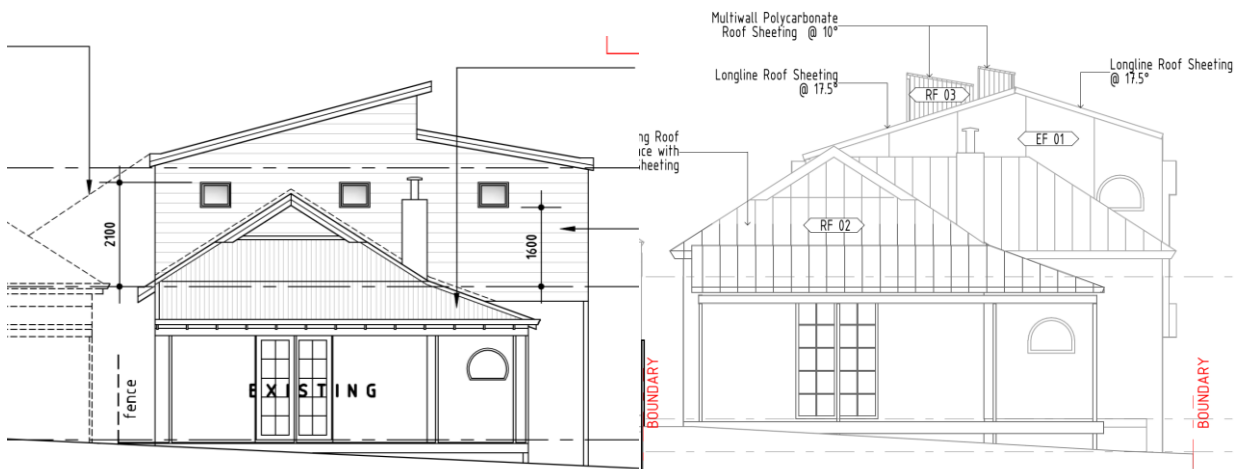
Comparison of original east (front) elevation (left) and amended plans (right).
